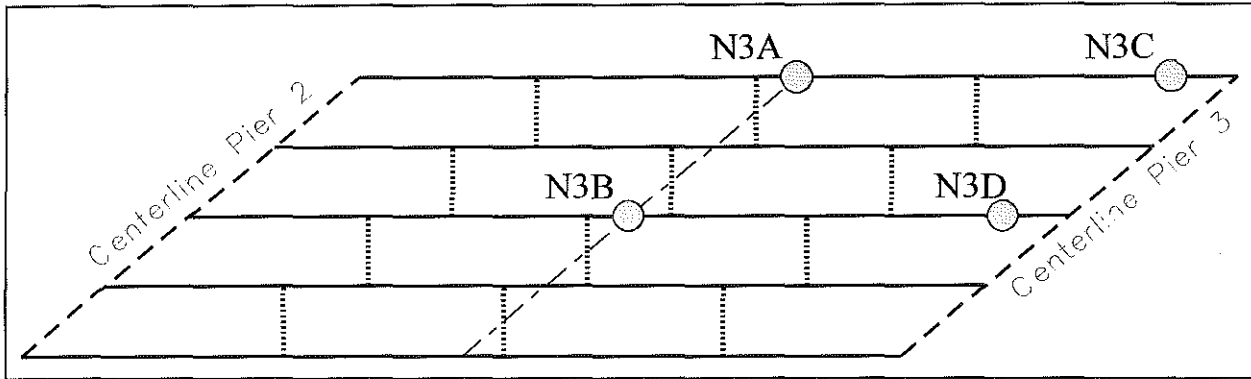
Locations for Girder Strain Gage Placement in the Northbound Bridge (Bridge Without Intermediate Diaphragms).
